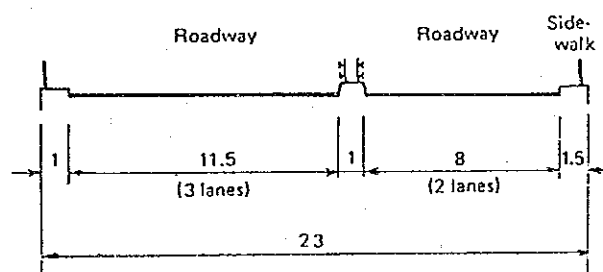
Cross Section of Bridge (B-Section)
